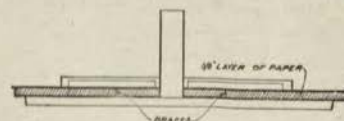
Section through galvanized-iron cover, showing paper insulation.
